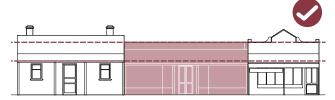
New building that respects the height, setbacks, external profile, facade pattern and materiality of adjoining contributory buildings.
